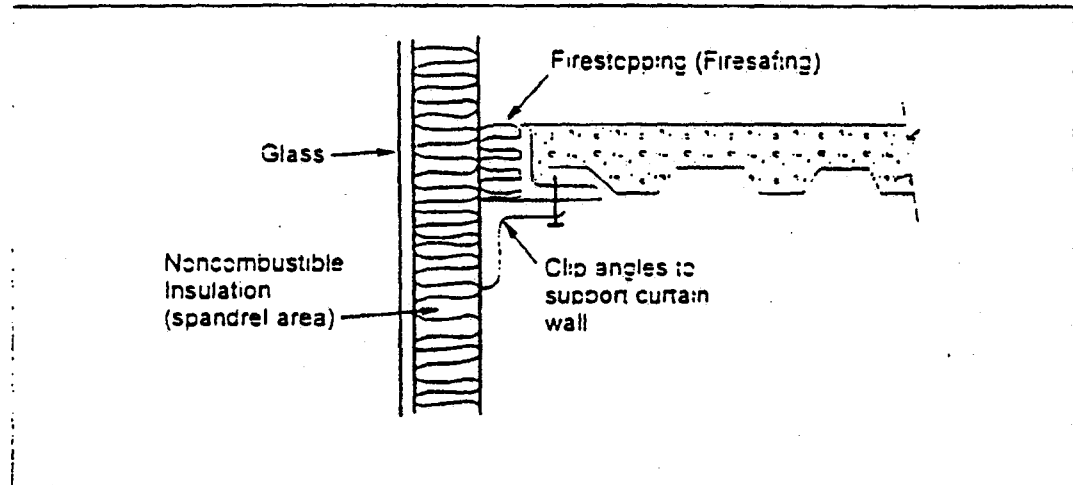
A Exterior wall glass in metal frame. Firestopping in joint space and supported by clip angle.
